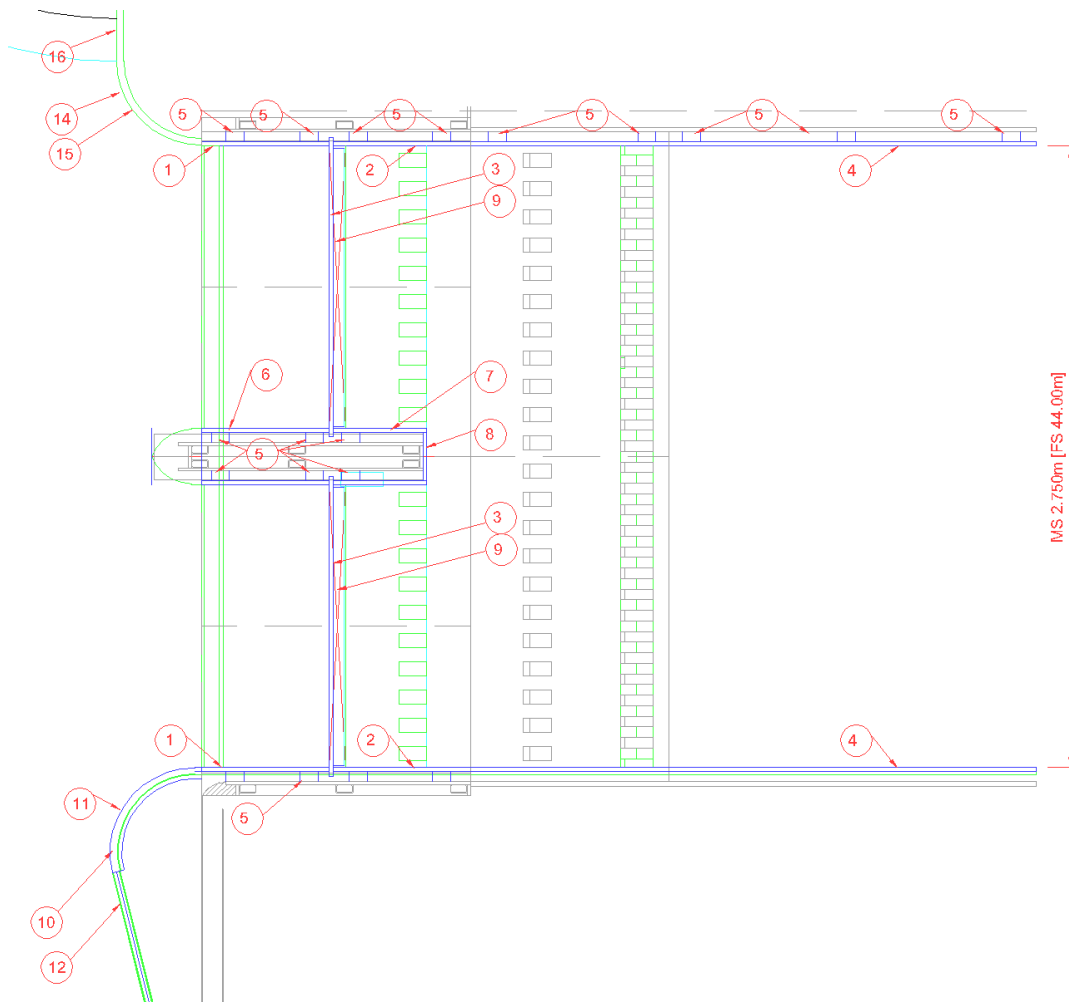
Example of a general assembly construction drawing of the revised model diversion inlet.
